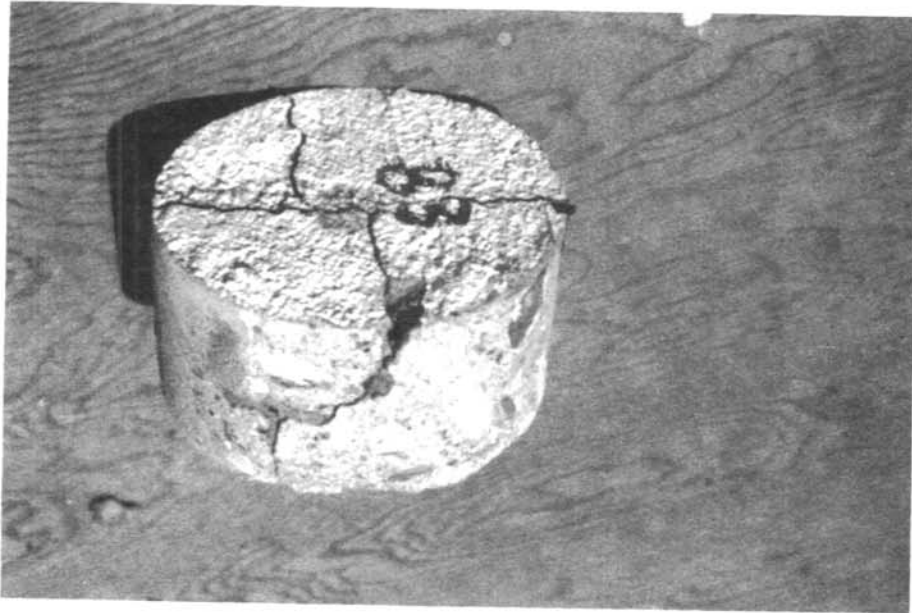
PVC strip has been installed too deep and the crack has formed through the sealing bulb and not through the vertical fin. Joint will not be watertight.
